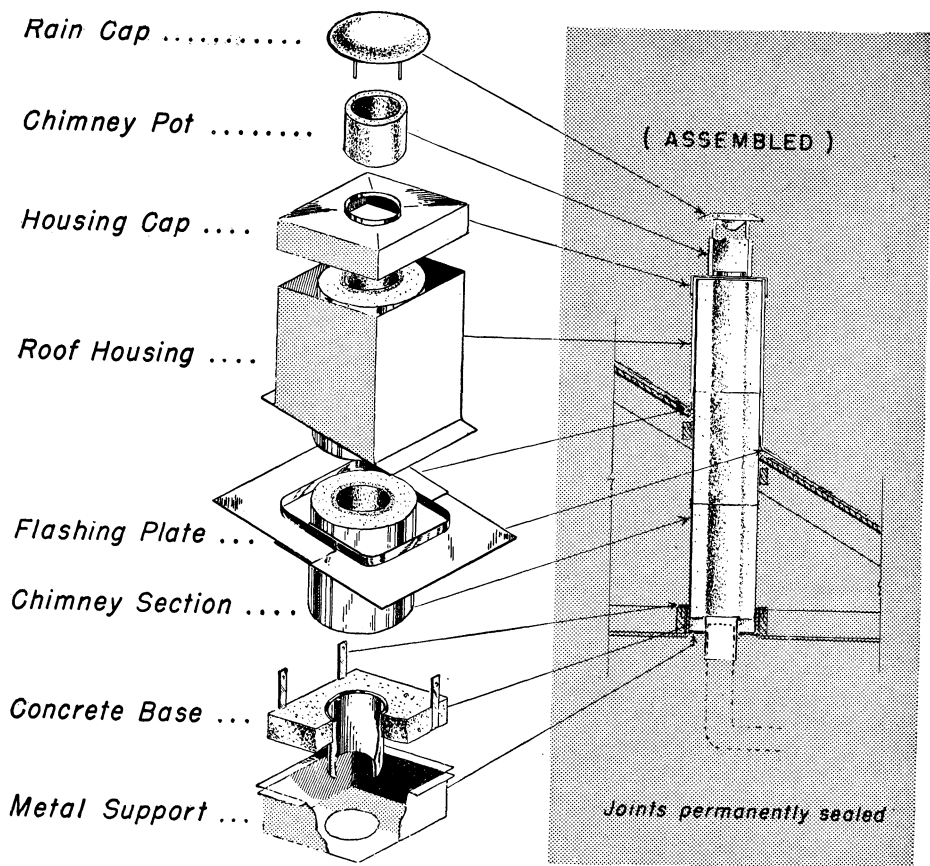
Prefabricated metal-lined chimneys give good protection against fire if installed and used according to the manufacturers' directions.
